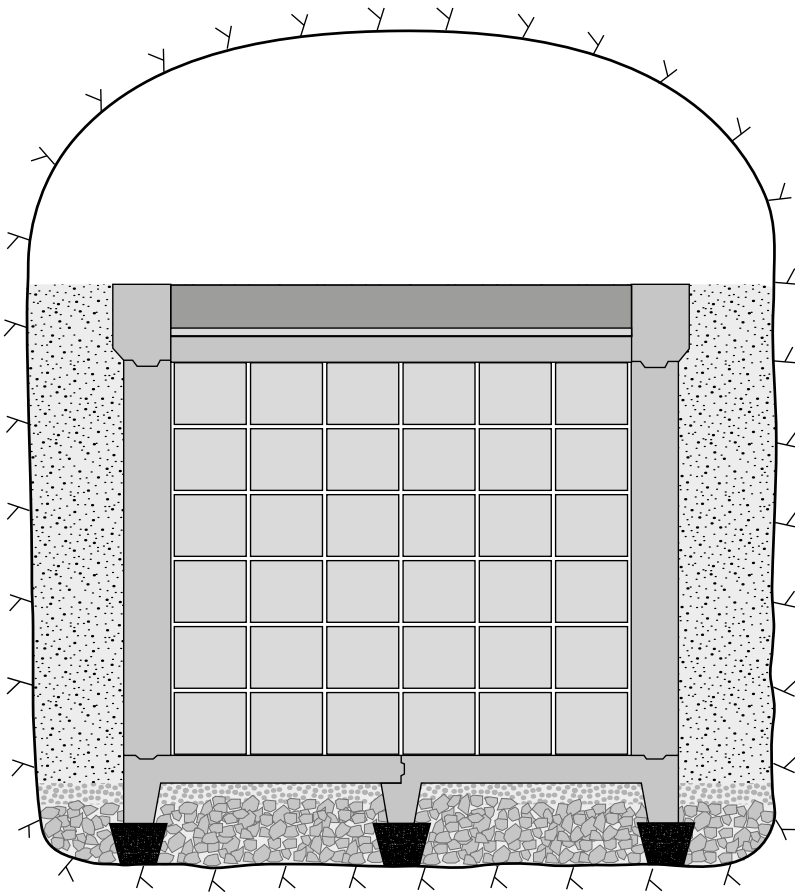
Illustration of the different concrete barriers, concrete moulds and macadam backfill in the 1BMA vault. Figure is not to scale.
